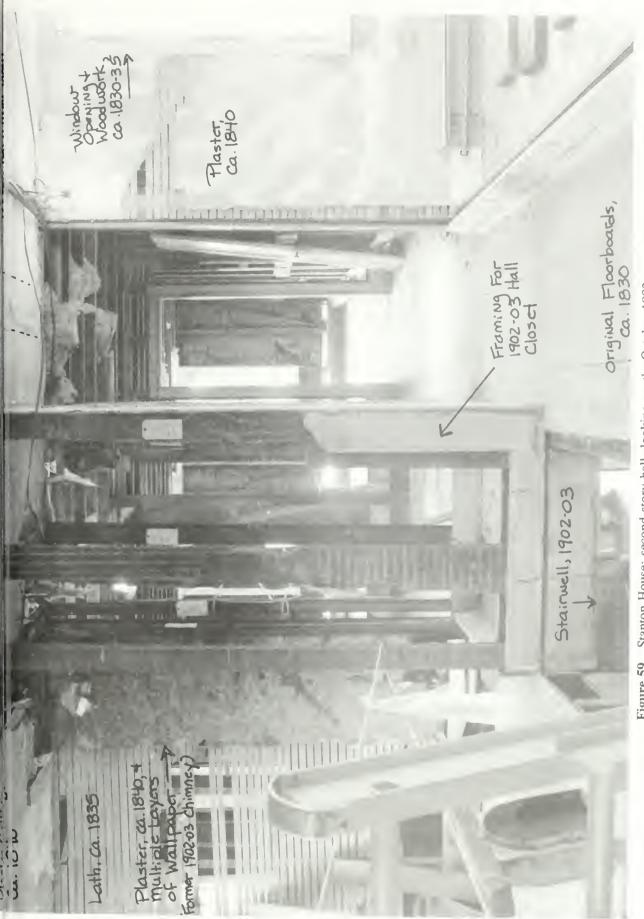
Stanton House: second-story hall, looking south, October 1982.
